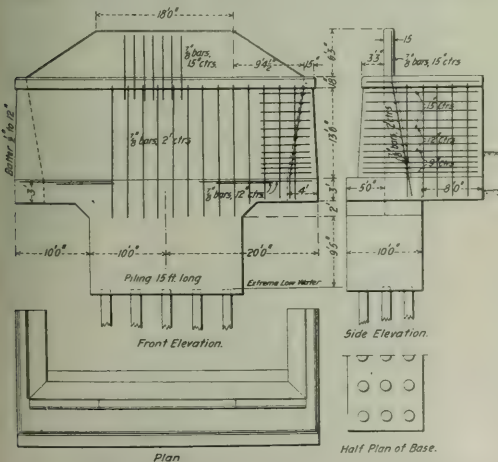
Plan for Reinforced Concrete; East Abutment.
